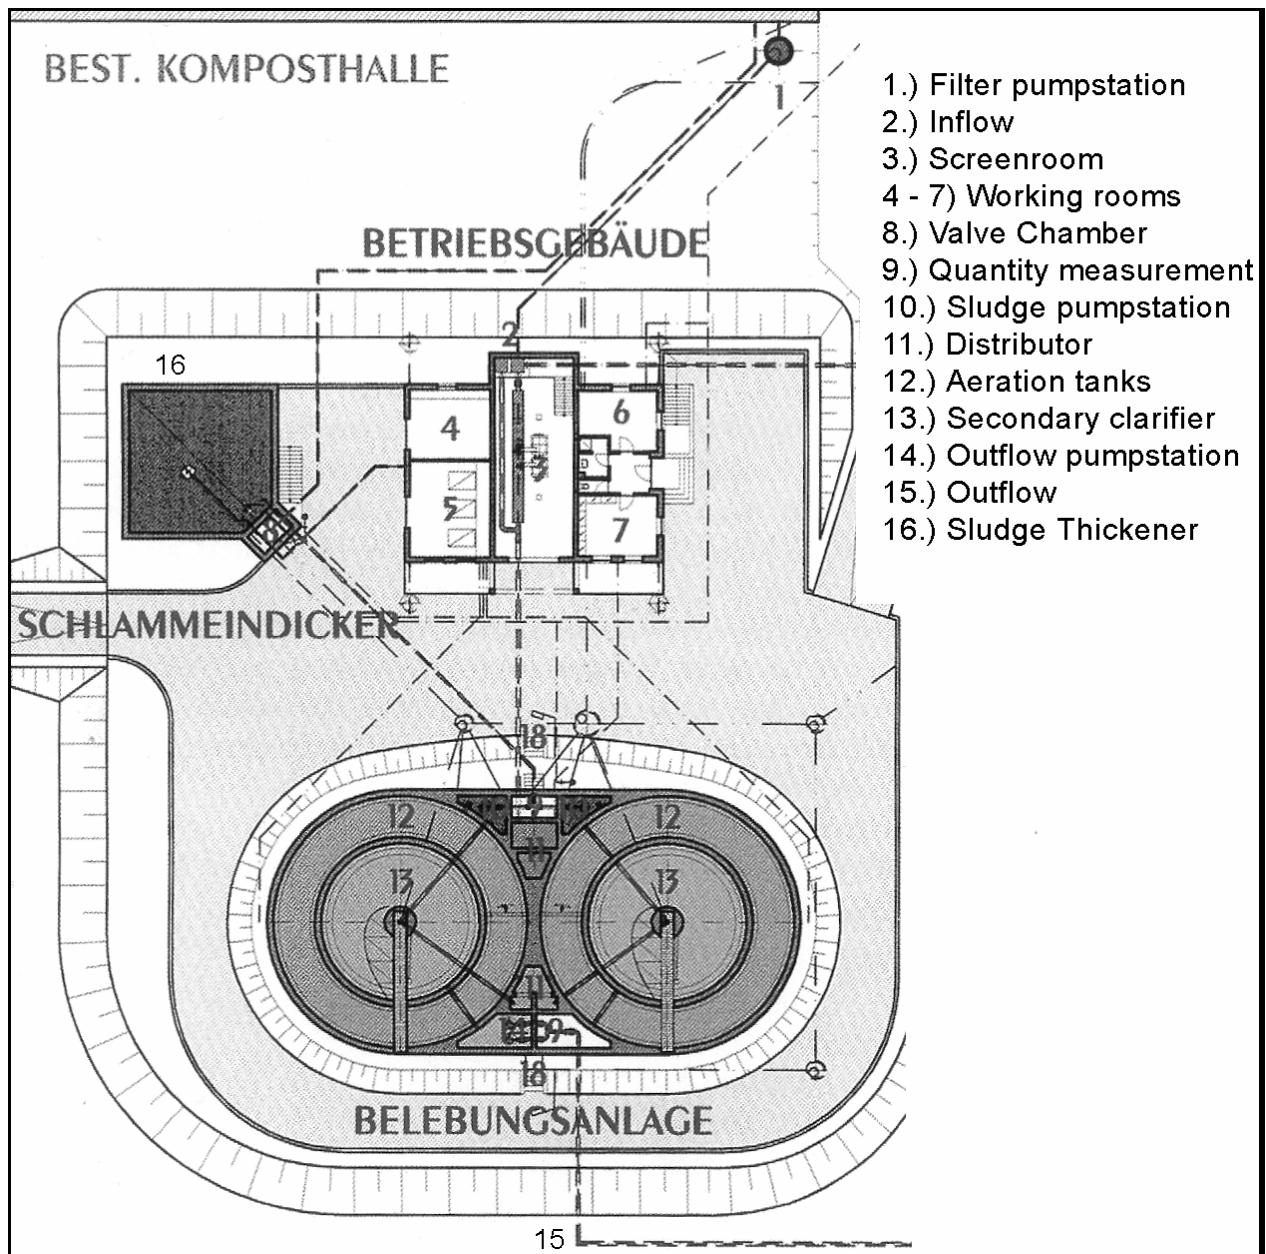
Floor plan of the WWTP Lasse (Marktgemeinde Lasse – Kläranlage, 1999)
